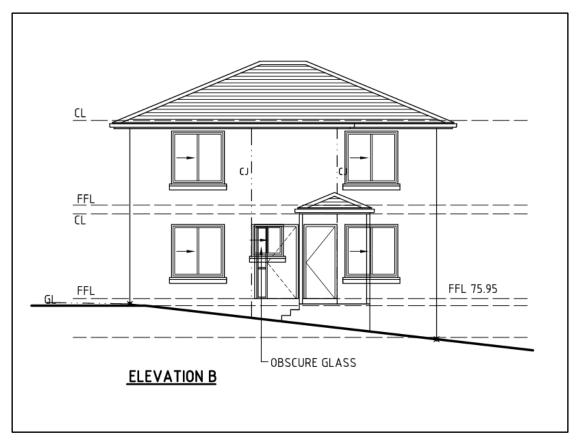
Elevation of Unit 4 as visible from Moore Park Drive, where only the lower level portico intrudes upon the frontage setback.
